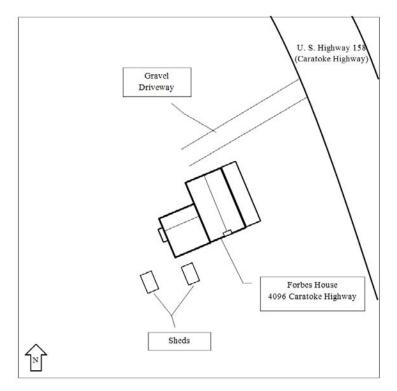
Site Plan of the Forbes House, Not Drawn to Scale.
